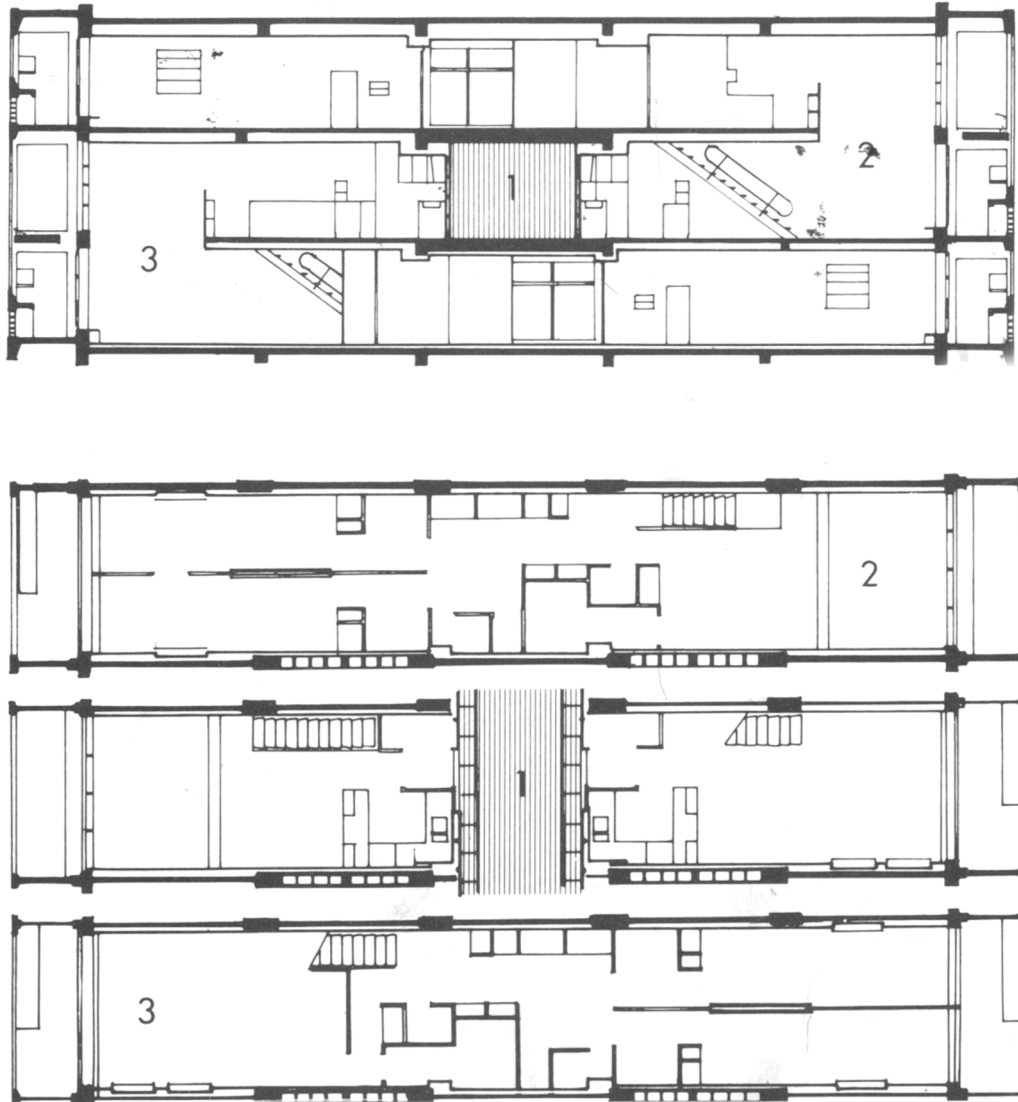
House Unit, Unité d'Habitation, Marseilles, 1952, plan layout, prototype
